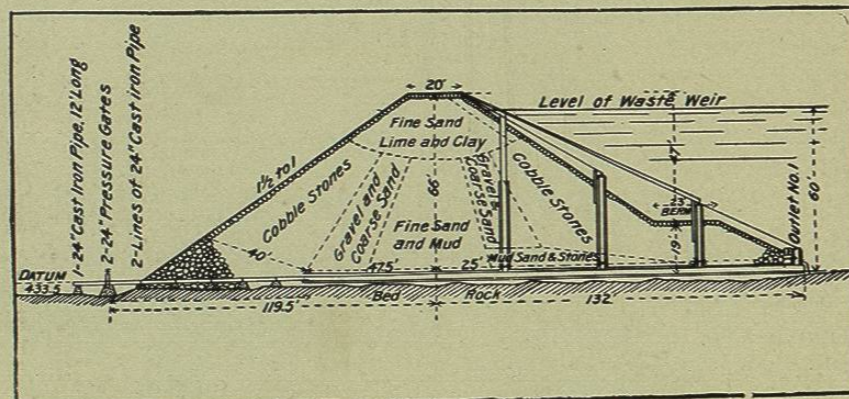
CROSS-SECTION OF LA MESA DAM.
